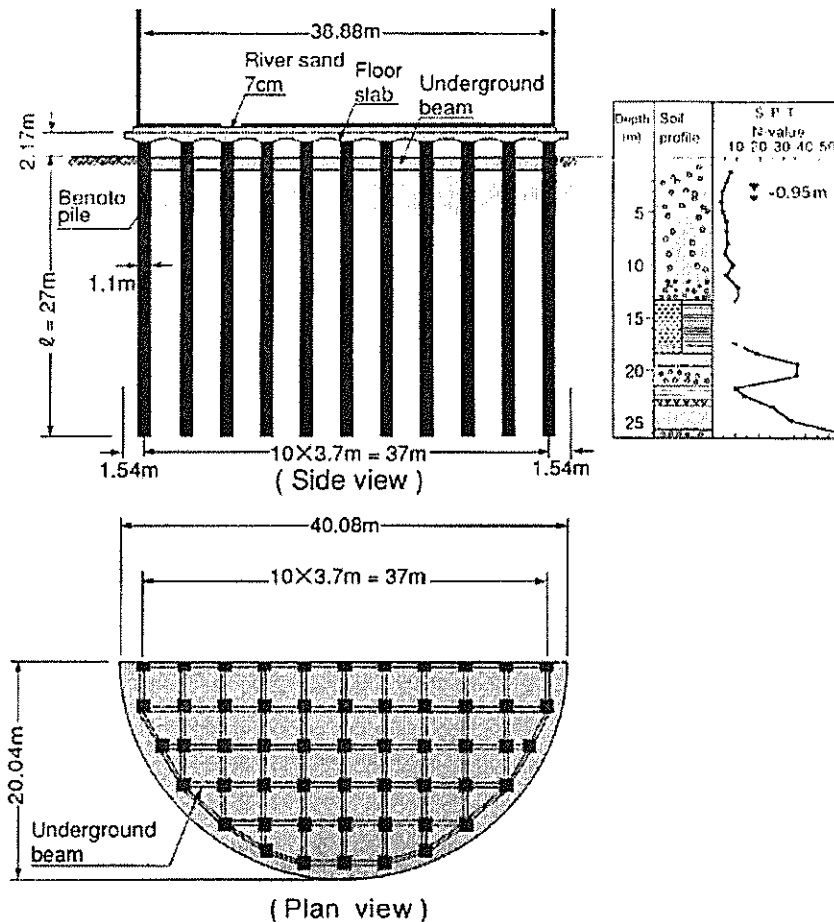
Side and Plan Views of the Foundation Pile Layout for the Cylindrical Tank 101.
